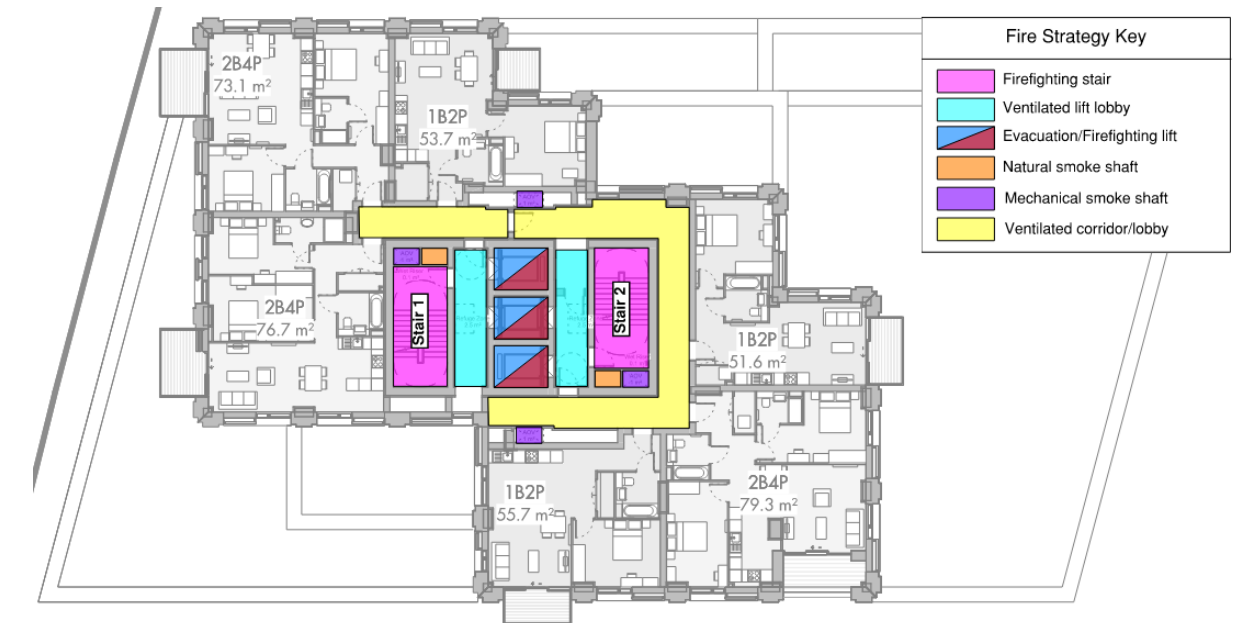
Horizontal means of escape - 24th to 23rd Floor
